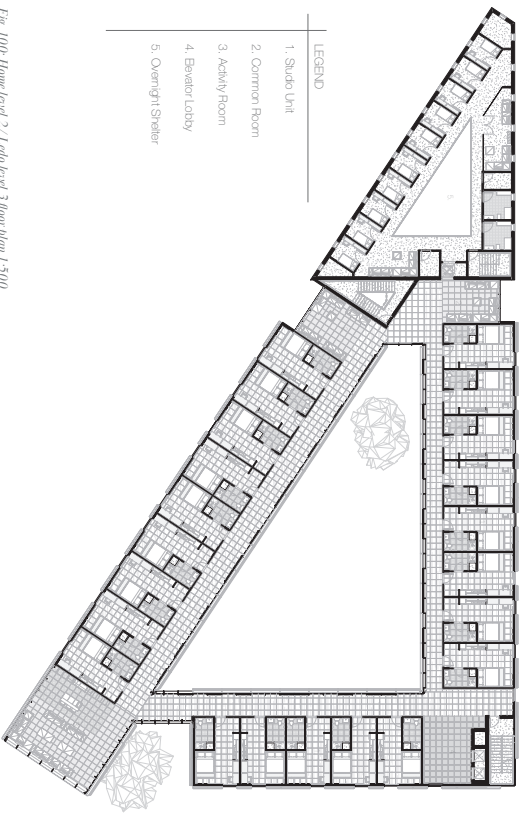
Home level 2 / Lido level 3 floor plan 1:500.
